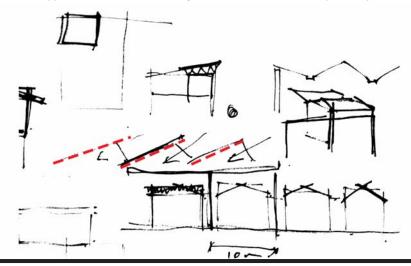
Exploration of roof angles facing the South, to allow more natural light to enter on the buildings predominantly stretching along their East/West axis'
